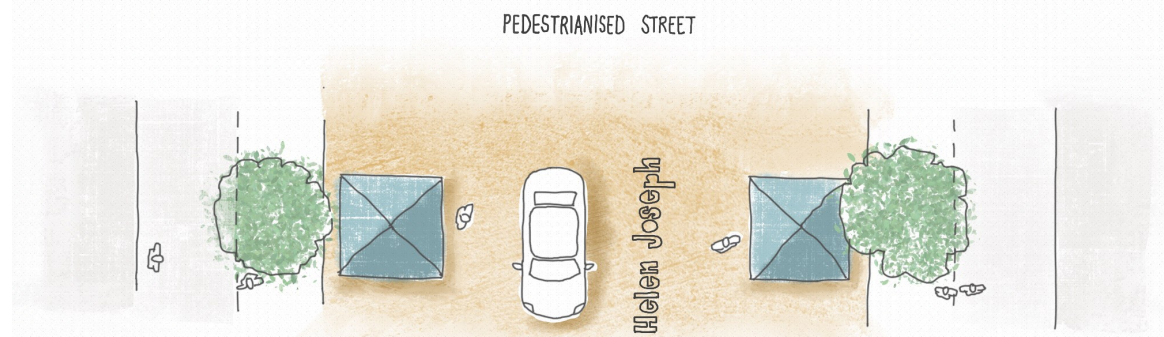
Plan of Helen Joseph street (Author, 2020)
